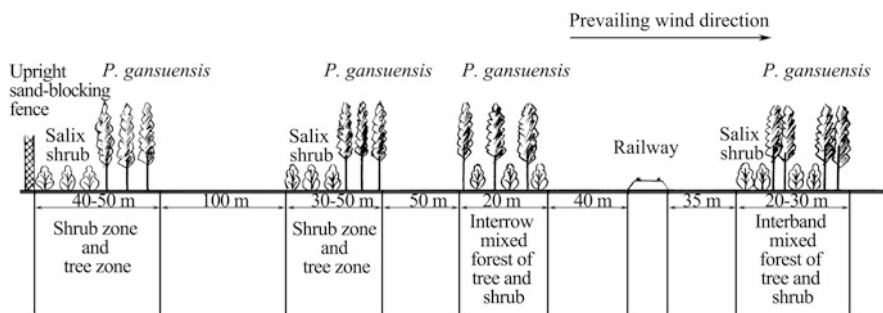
Cross section of a complete sand-prevention system for the Yumen section of the Lanzhou-Xinjiang Railway (Wang 2011b)
